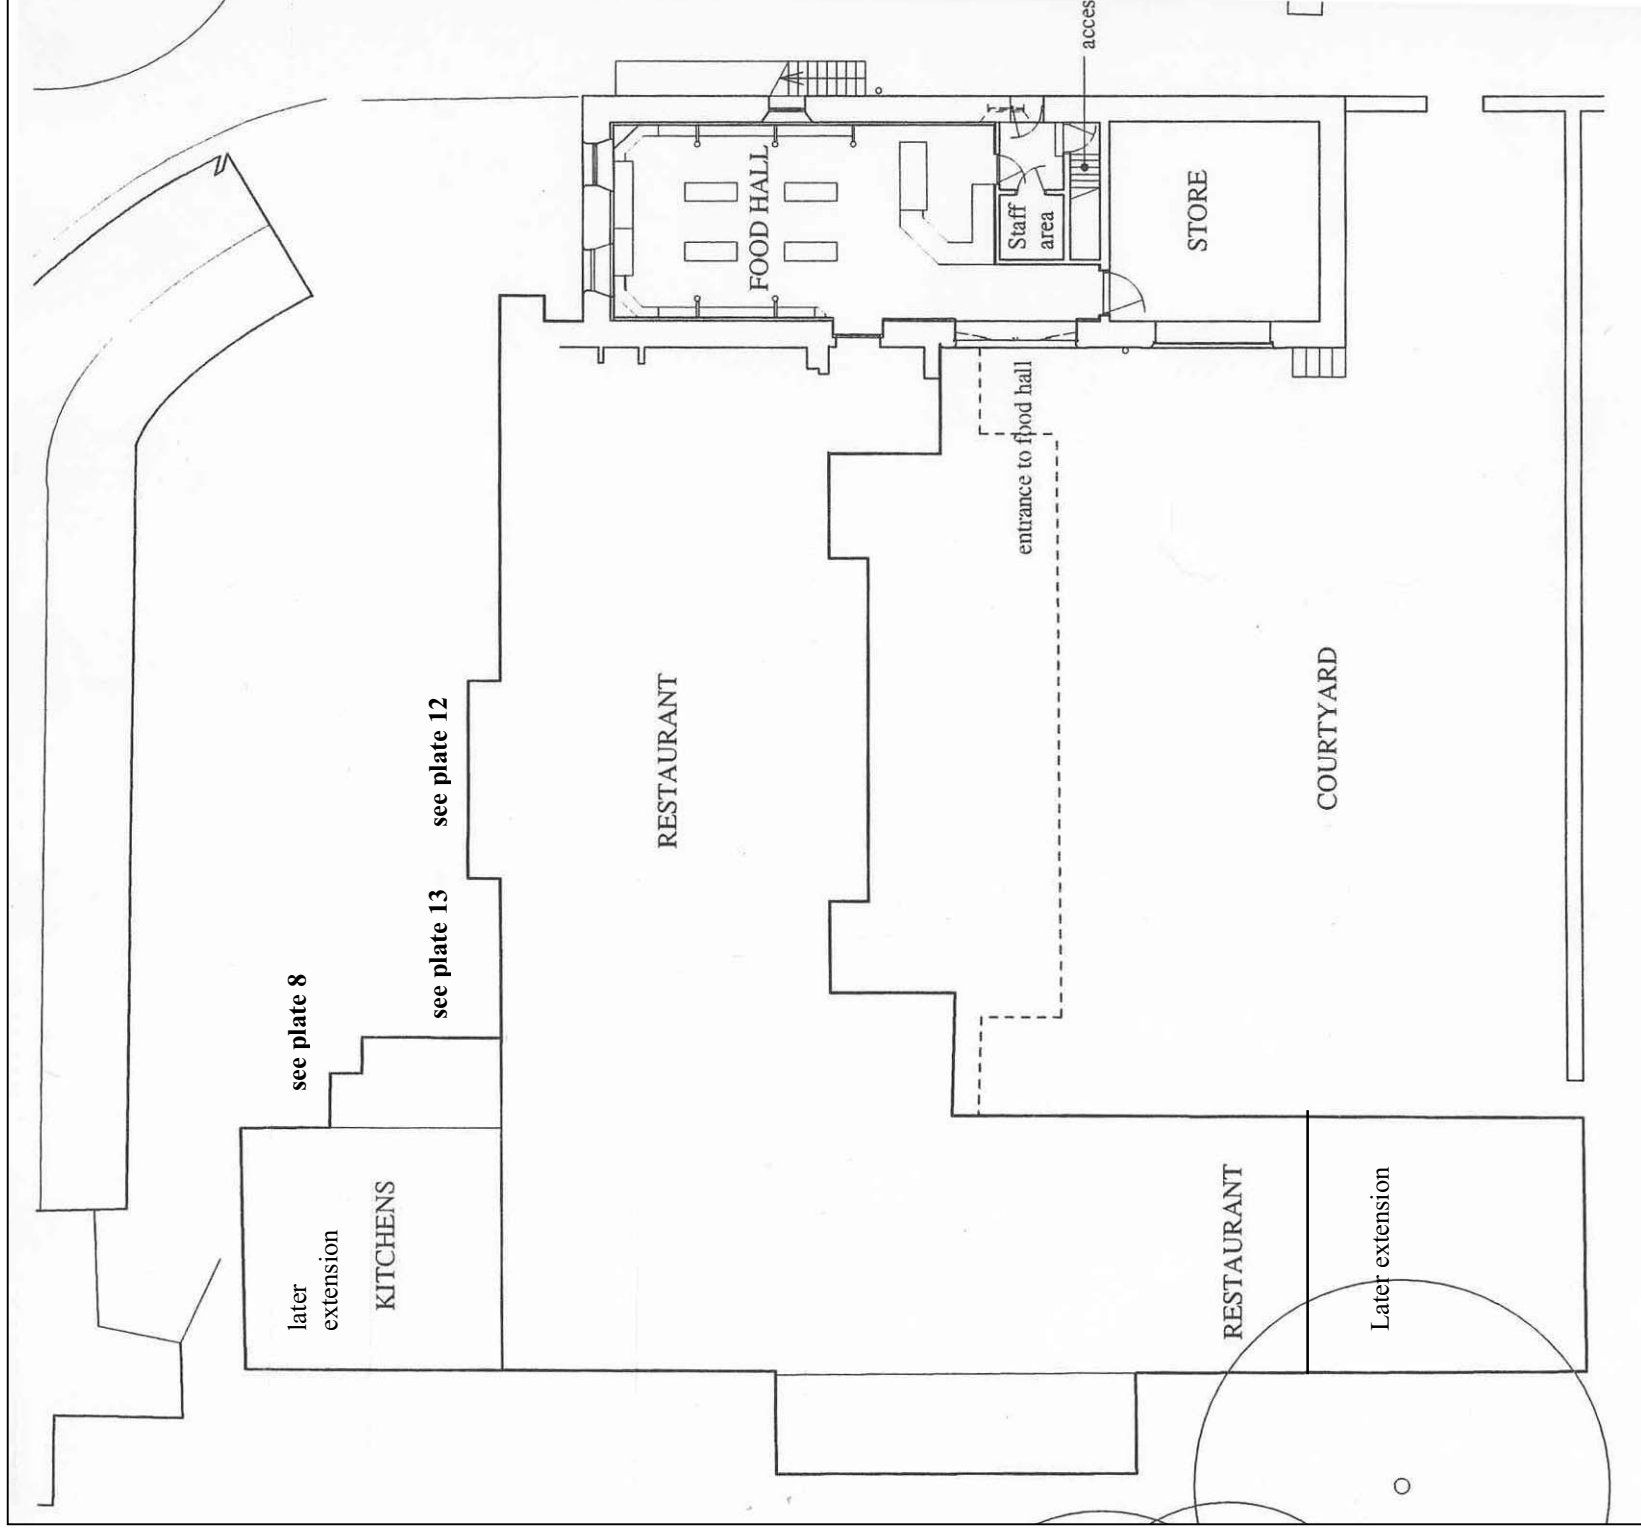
The Stable Block: General Site Plan. Scale: 1:200
